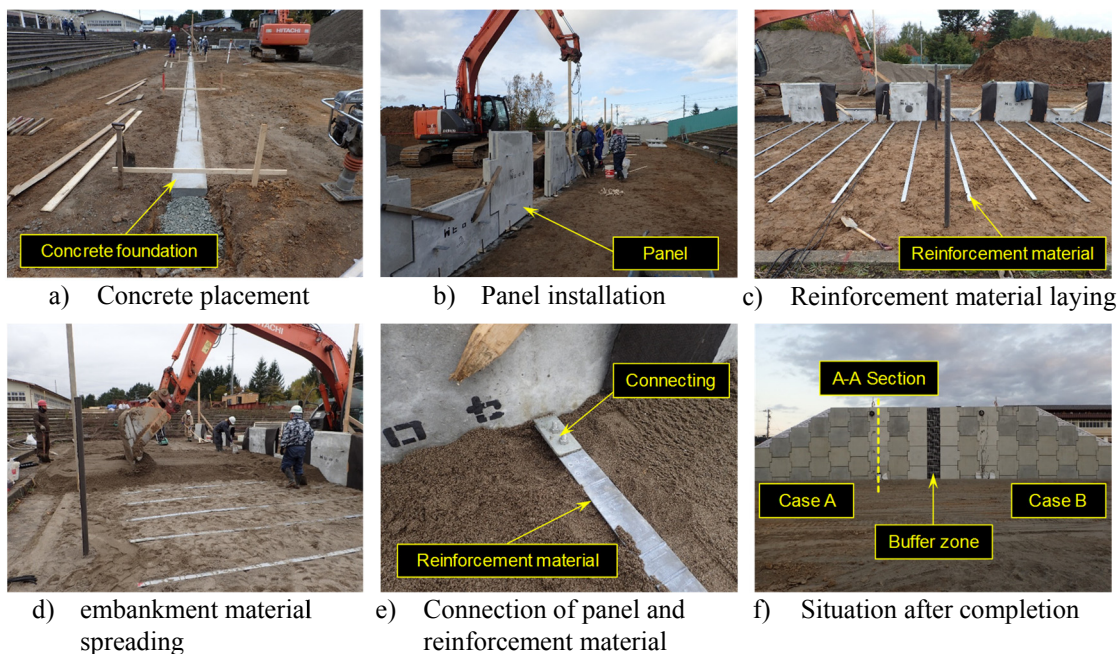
Construction situation of full-scale steel strip reinforced soil walls
